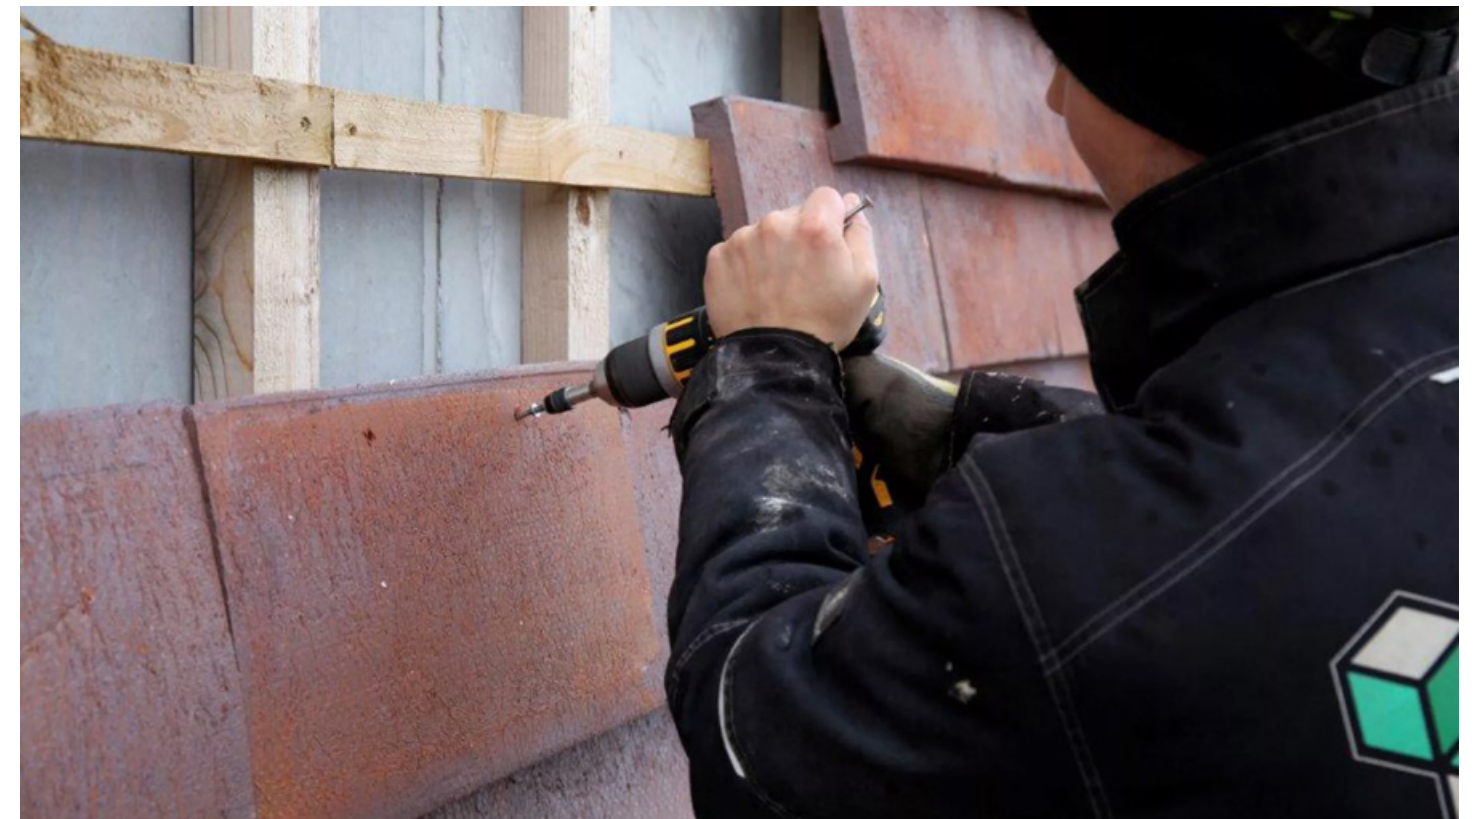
Installing with metal screws fastened through pre-drilled holes in the clay cladding and into wood furring strips beyond (Photo courtesy of Petersen Tegl)
